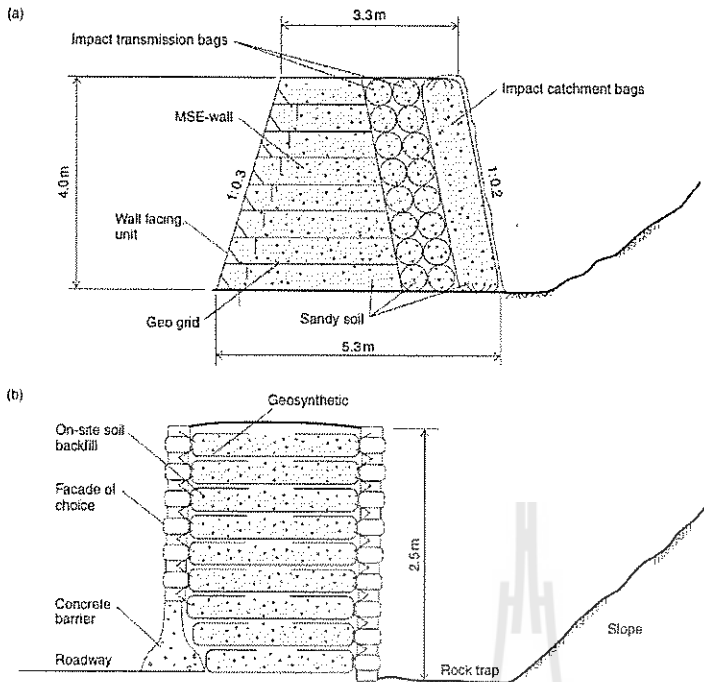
Rock fall barriers constructed with soil and geofabric, and a variety of facings: (a) a 4-m high Wall with impact energy capacity of 5000 kJ (Protec, 2002); (b) a 2.5 m high wall with energy capacity of 950 kJ (Barrett and White, 1991).
